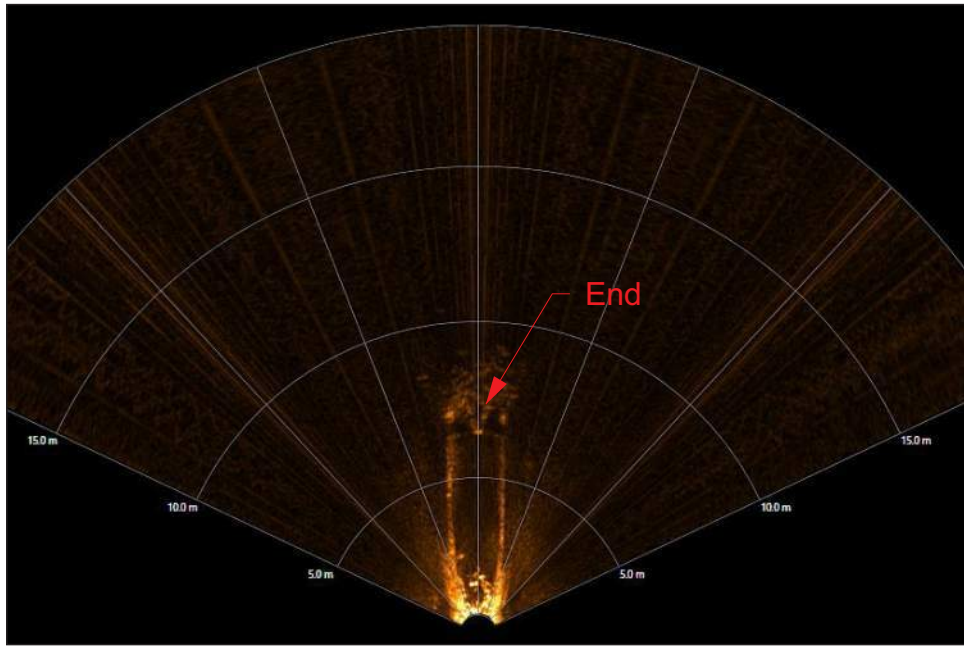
Sonar image at 772 feet downstream of Access Point 1. End of outfall 26 feet ahead.
